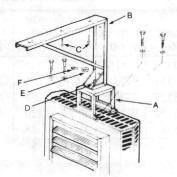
CEILING MOUNT HORIZONTAL DISCHARGE
